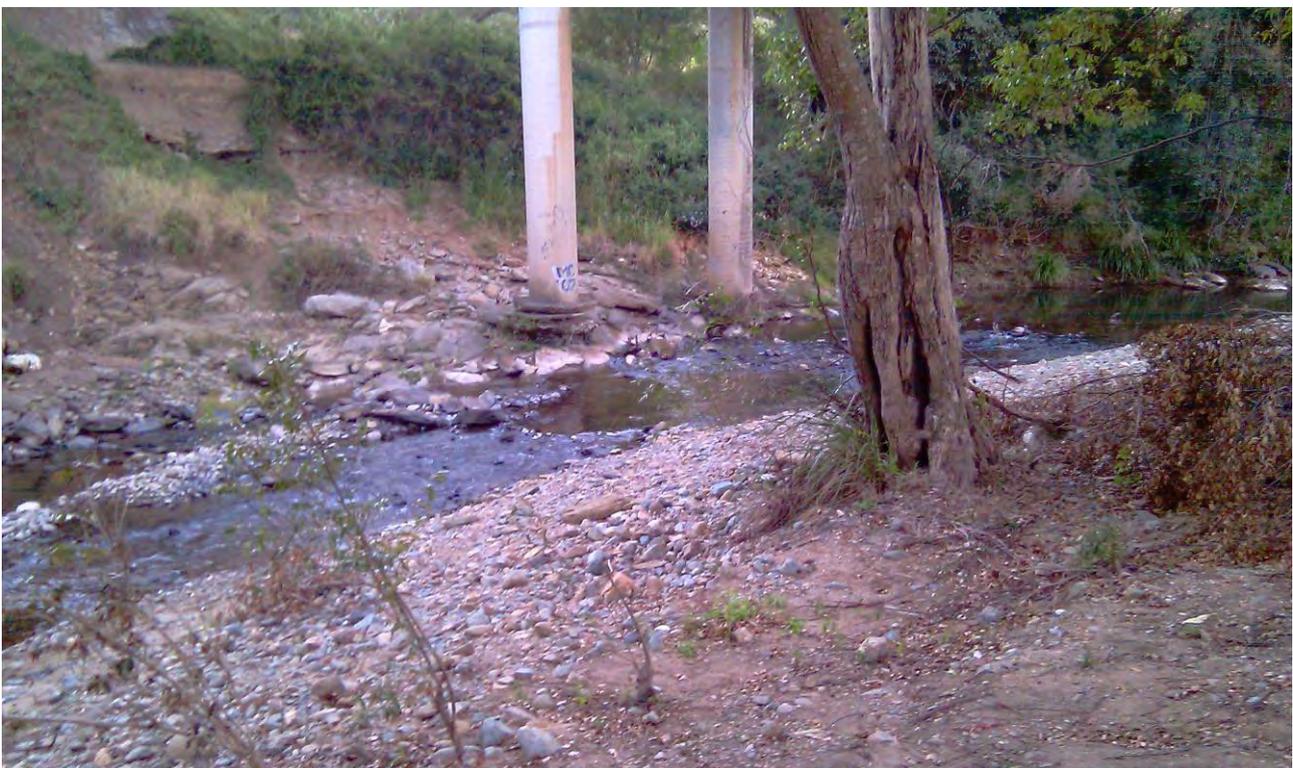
Cedar Creek, under Eatons Crossing Road Bridge
